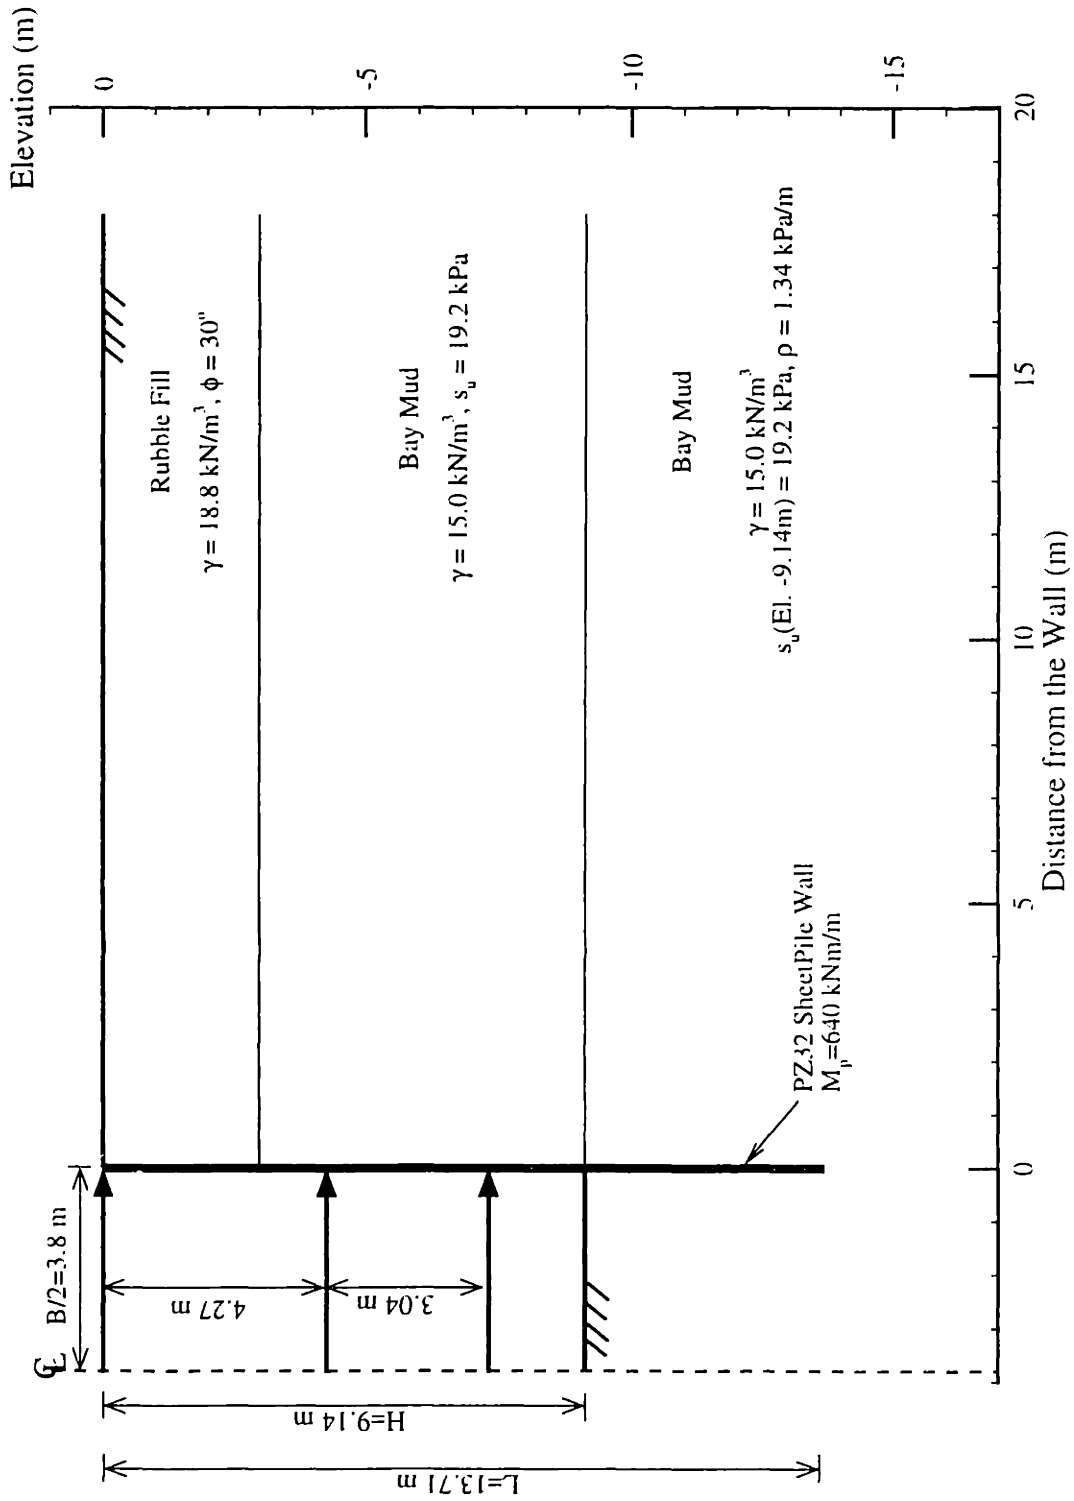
A.7 Excavation Geometry at Davidson Avenue #1 (Clough & Reed, 1984)
